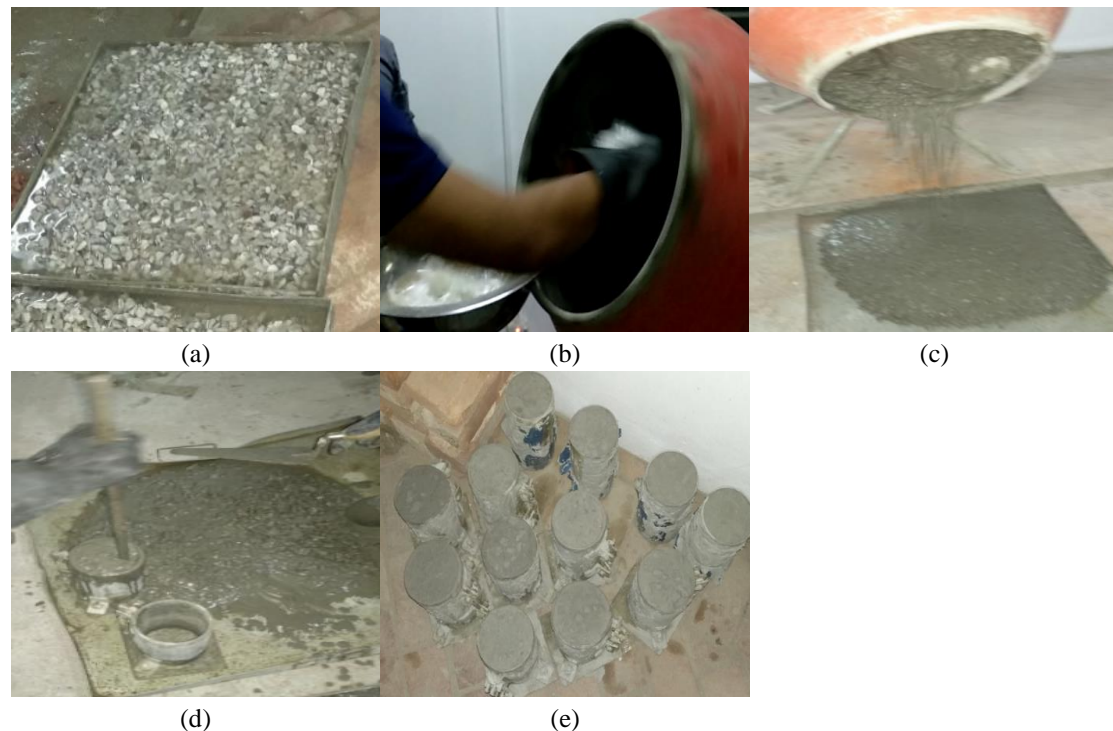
Coarse aggregate b) mixing fiber in concrete c) concrete casting d) tamping concrete e) concrete molding in cylinder
